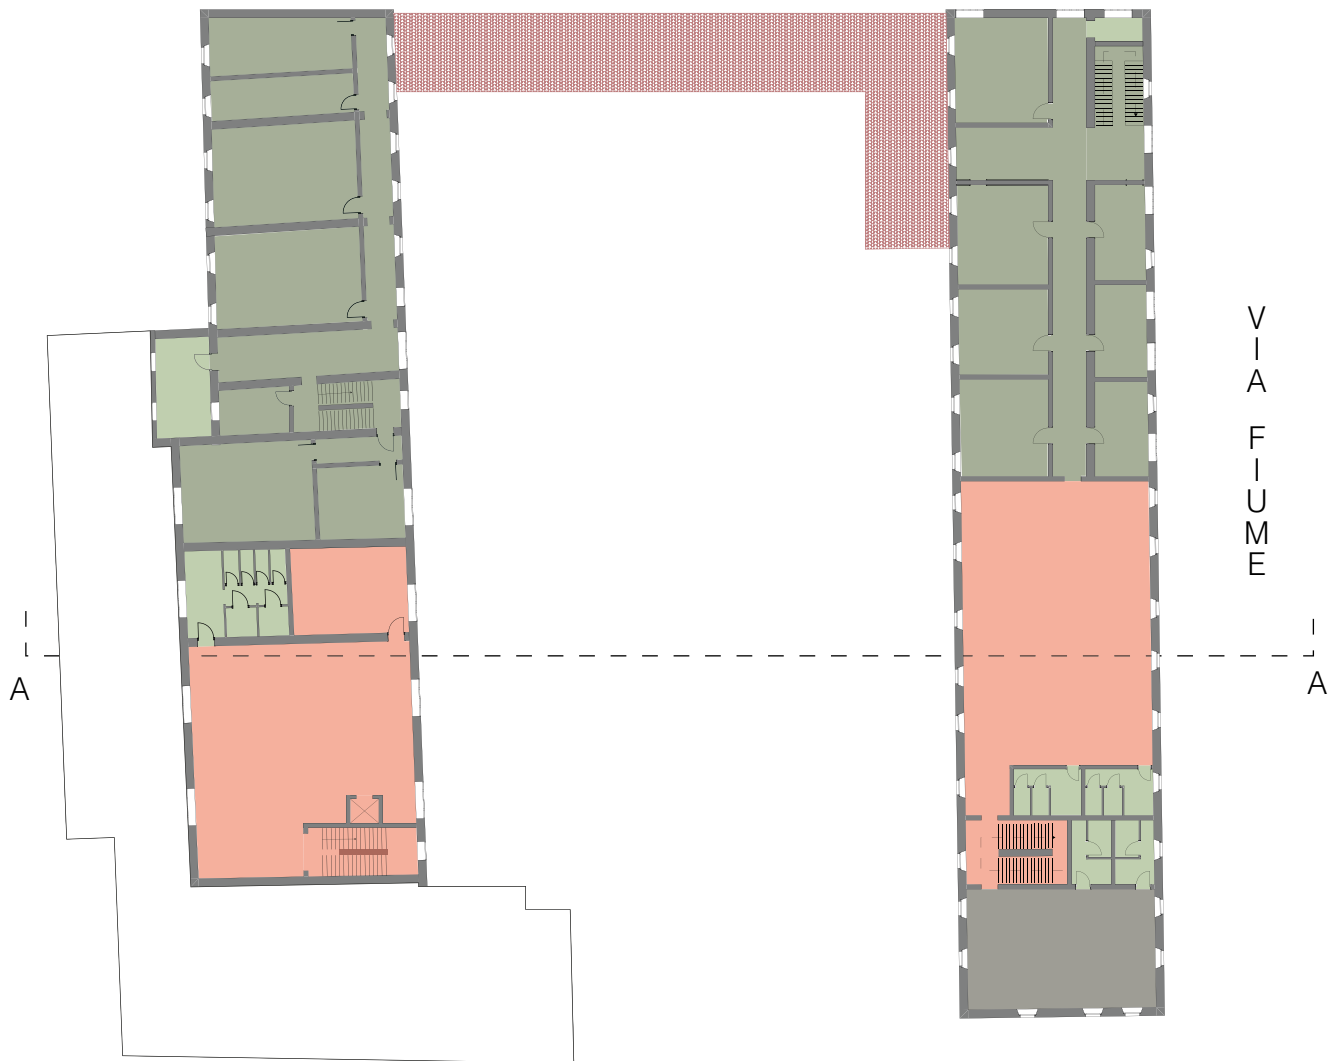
Floor plan of the first floor of Sisters' House I, II, laundry room,distribution project.
